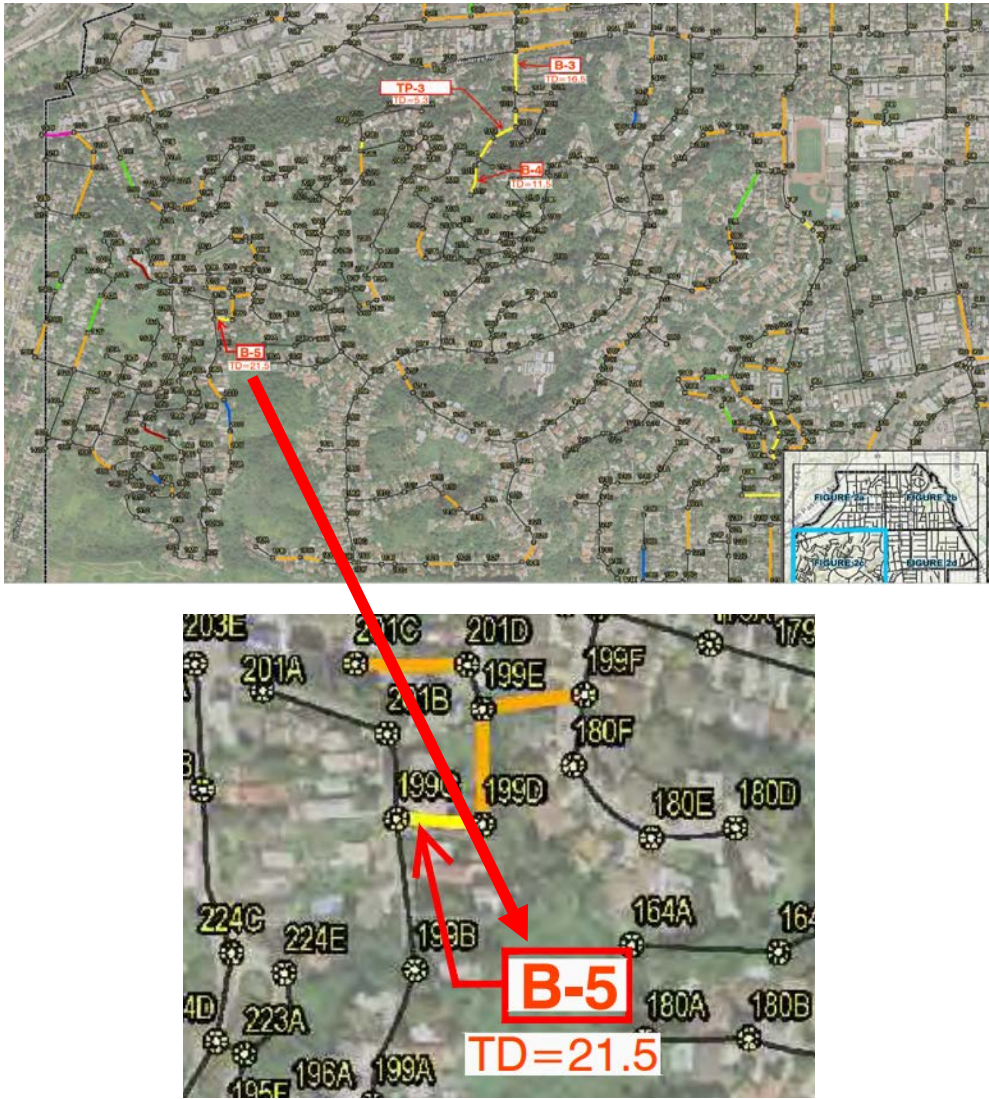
Manhole to Manhole View of River Basin in City of South Pasadena
